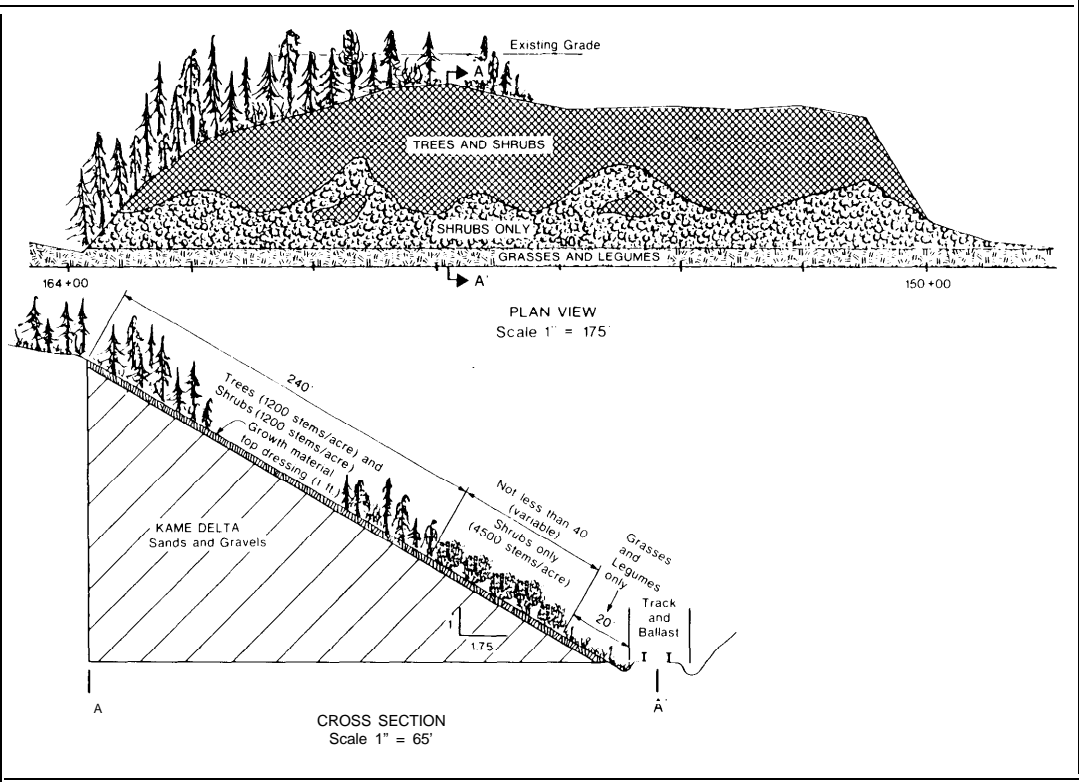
Reclamation Plan for Mountain Creek Pit Cut
